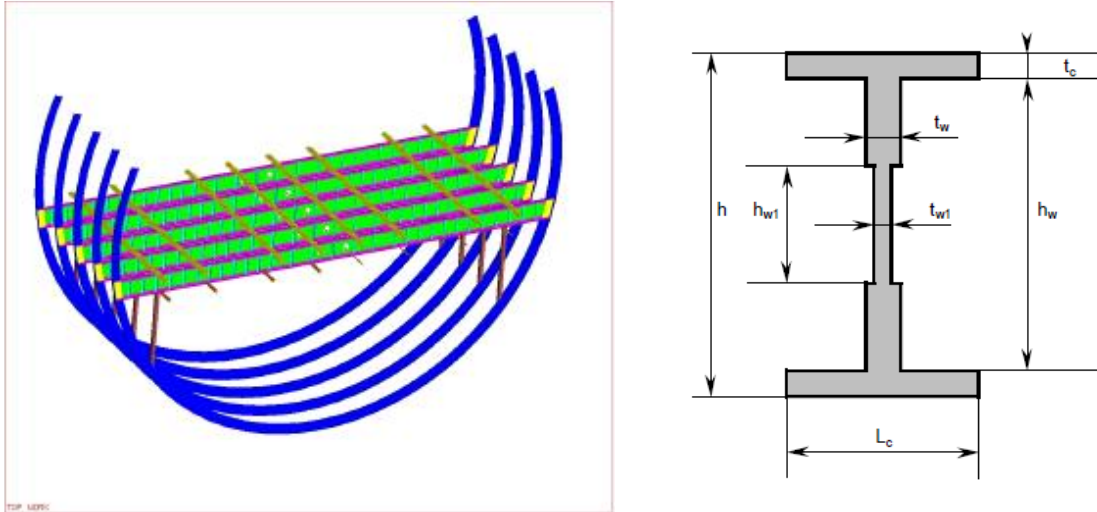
3-D view of The Floor Beam Structures and Cross Sectional Dimensions for Design Iterations [29].
